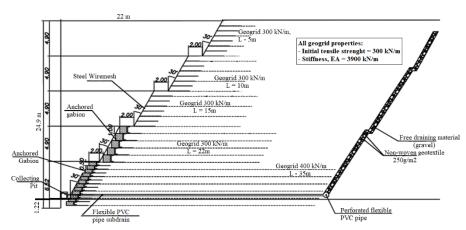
Typical HRSS cross section for Tana Torajaairport retaining wall.
